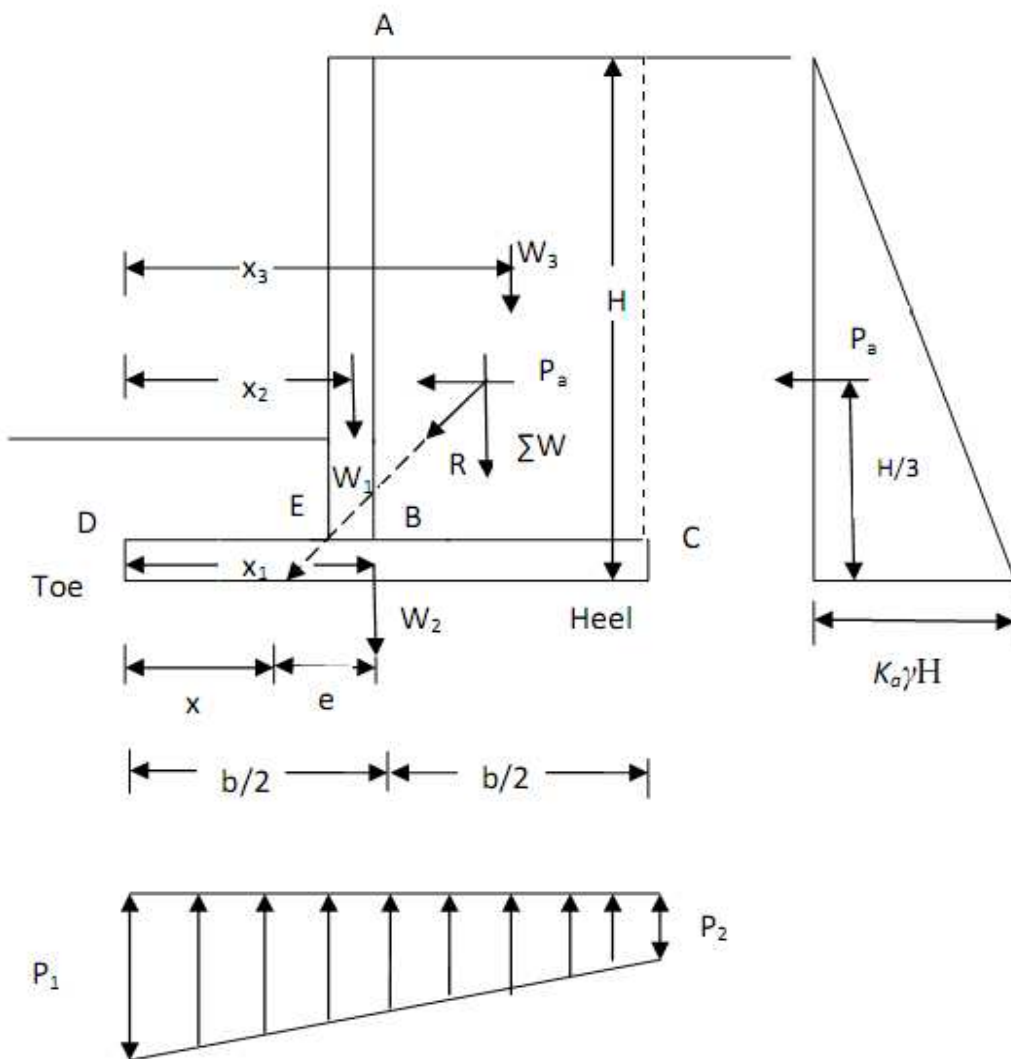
Schematic Representation of Forces Acting On a Cantilever Retaining Wall
